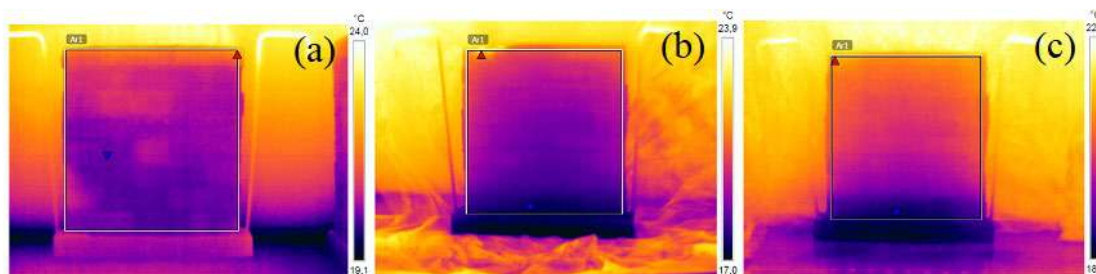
Sample PB1: a) dry wall; b) humid wall; and c) wall at 28 days
